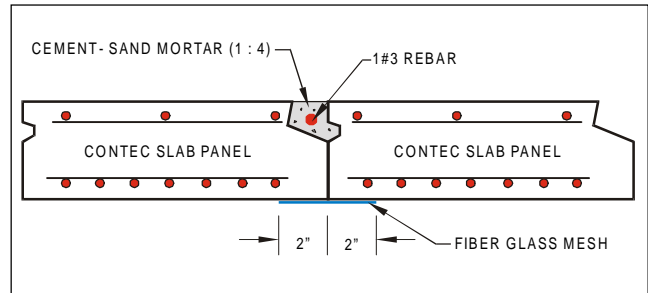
Typical detail of longitudinal joint between Contec Slab Panels.
